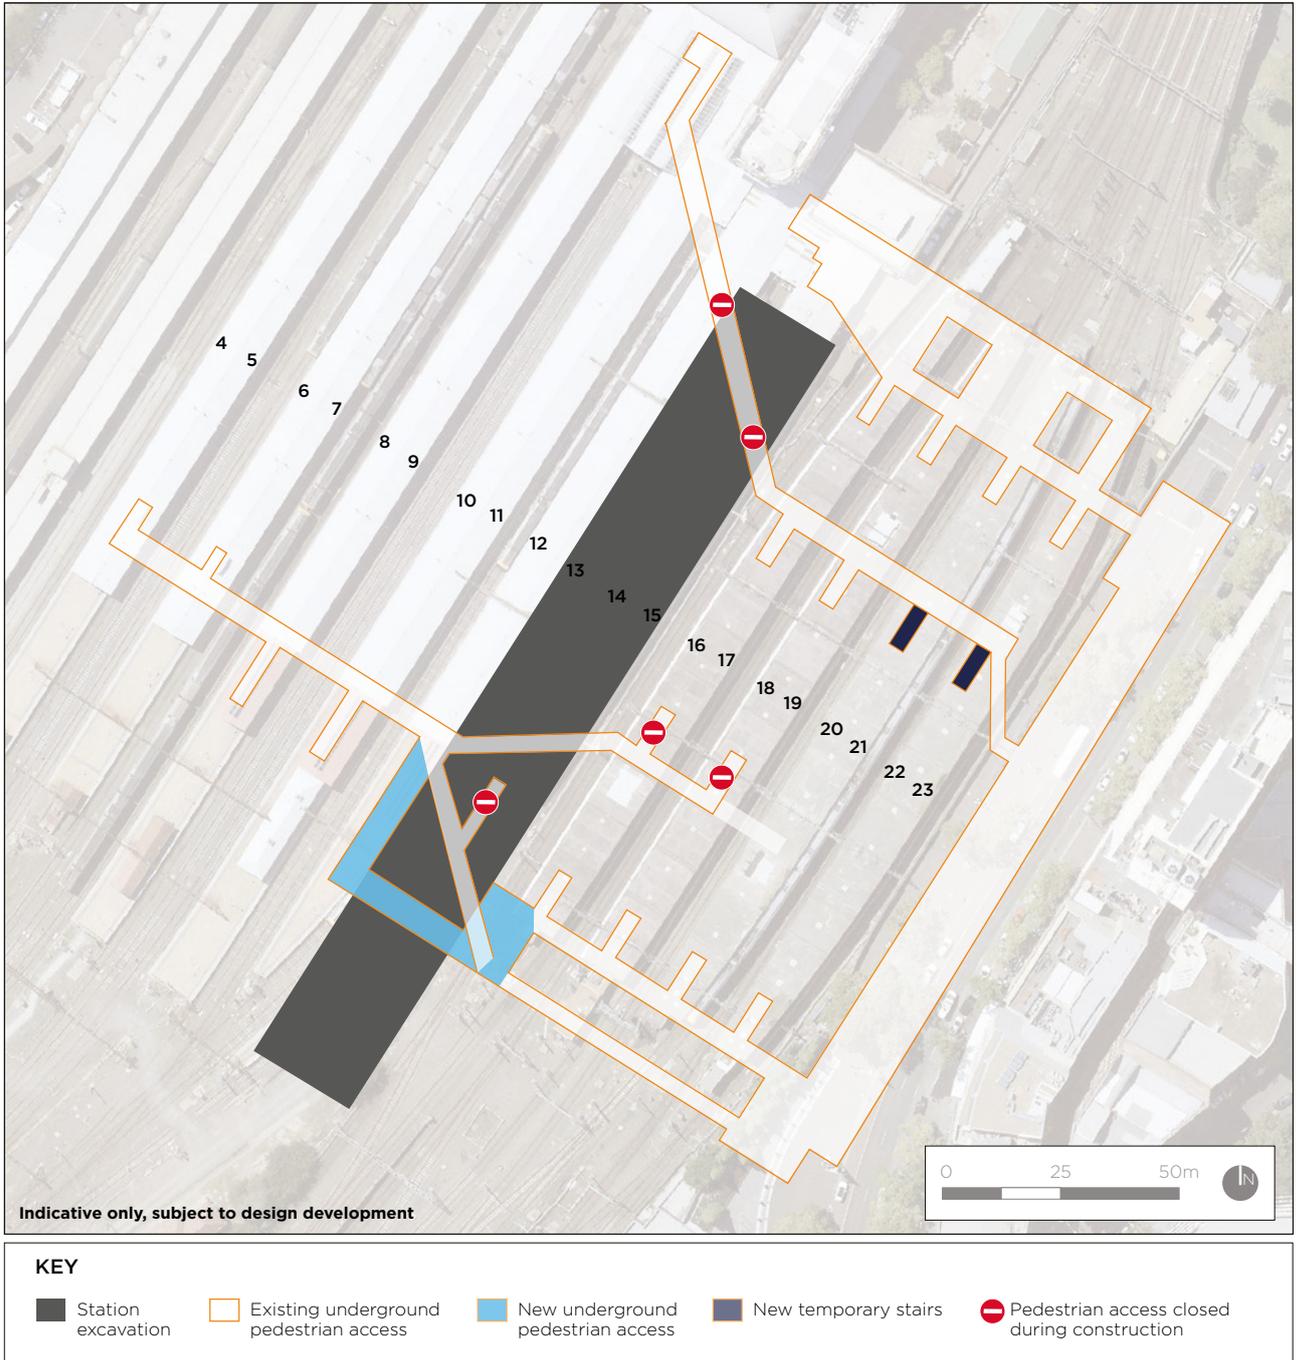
Central Station – staged closure of the existing and realigned southern pedestrian connection, and additional suburban platform stairs
